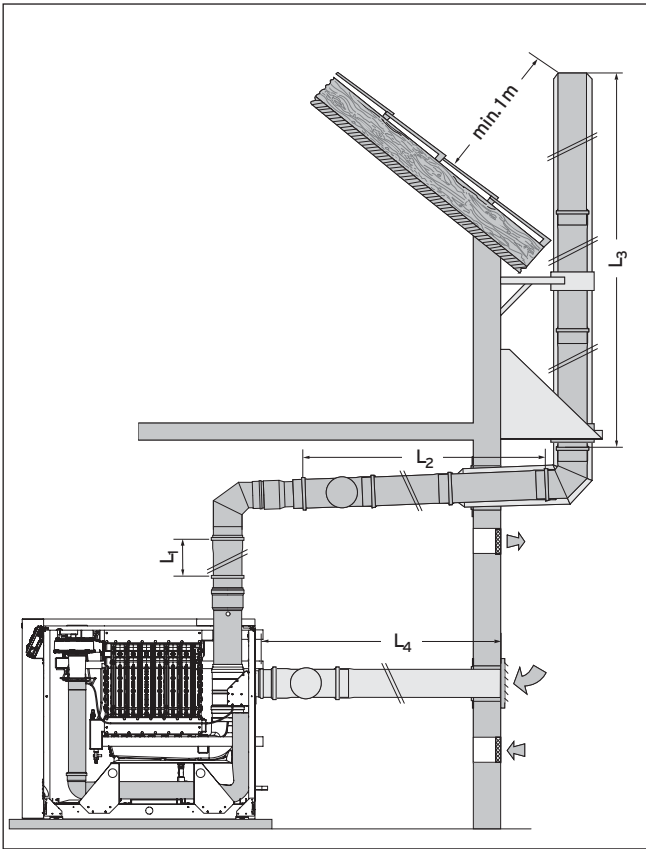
Air/flue pipe - room sealed, combustion air through the external wall, flue pipe on the facade
